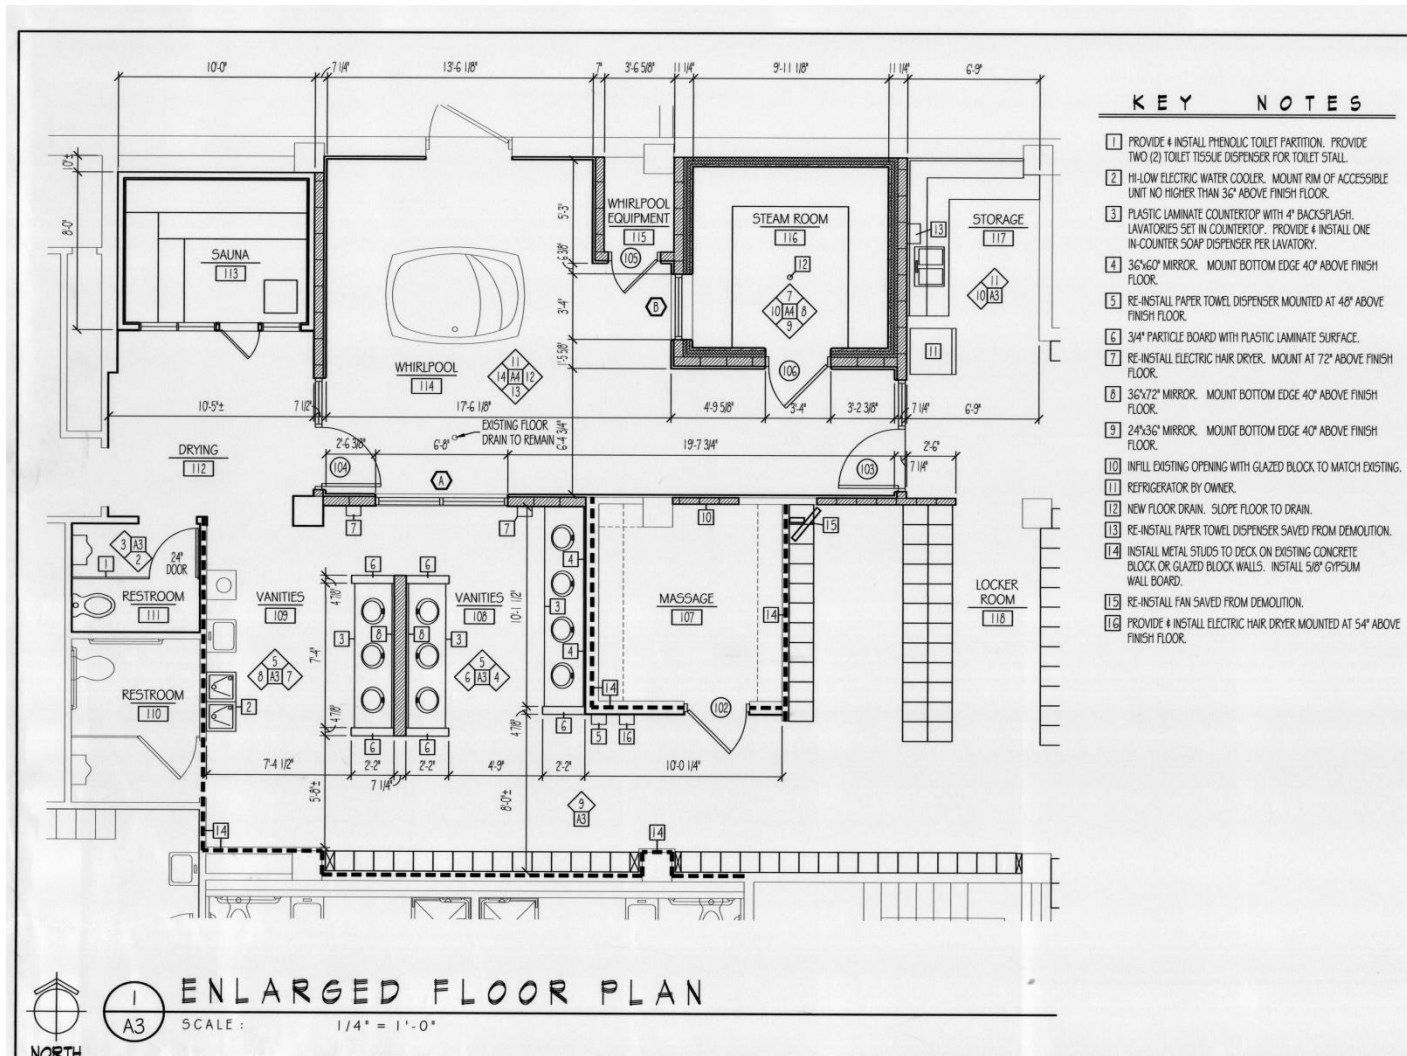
Enlarged Floor Plan, Men's Health Center (Walton and Associates 2001; Detail of Sheet No. A3).
